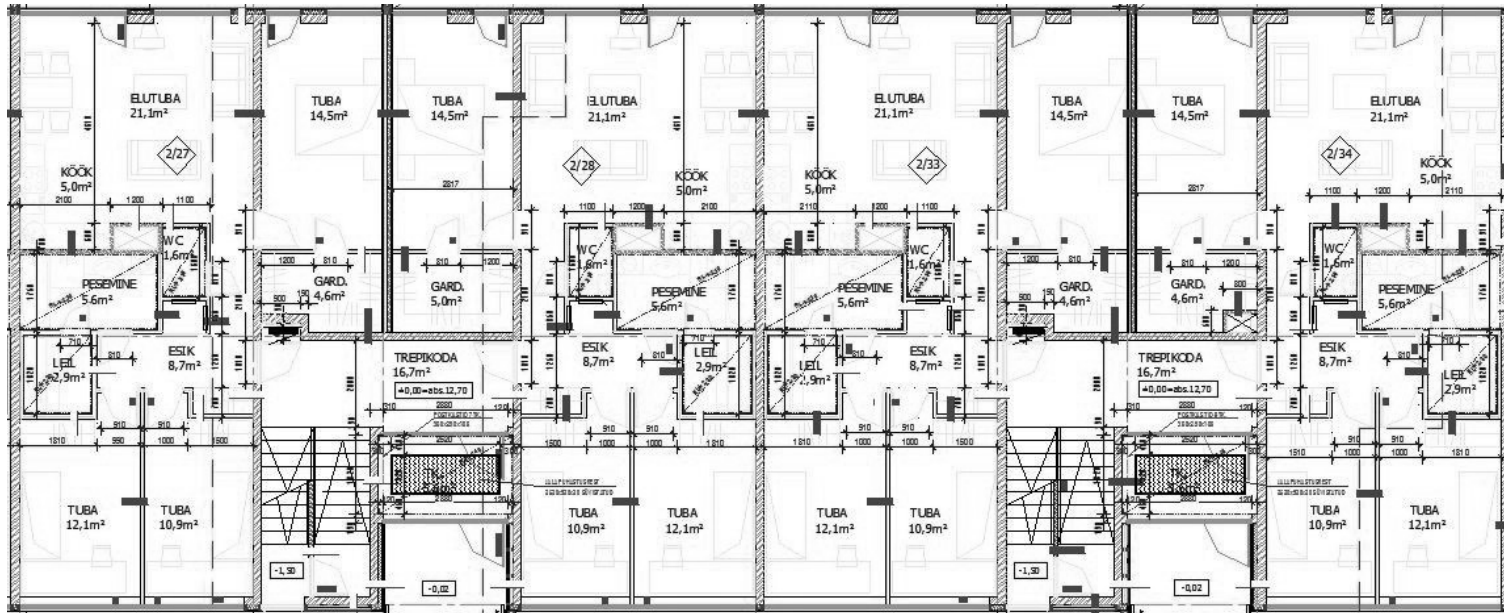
First and second floor plan of the four storeys reference apartment building, containing 4 apartments
